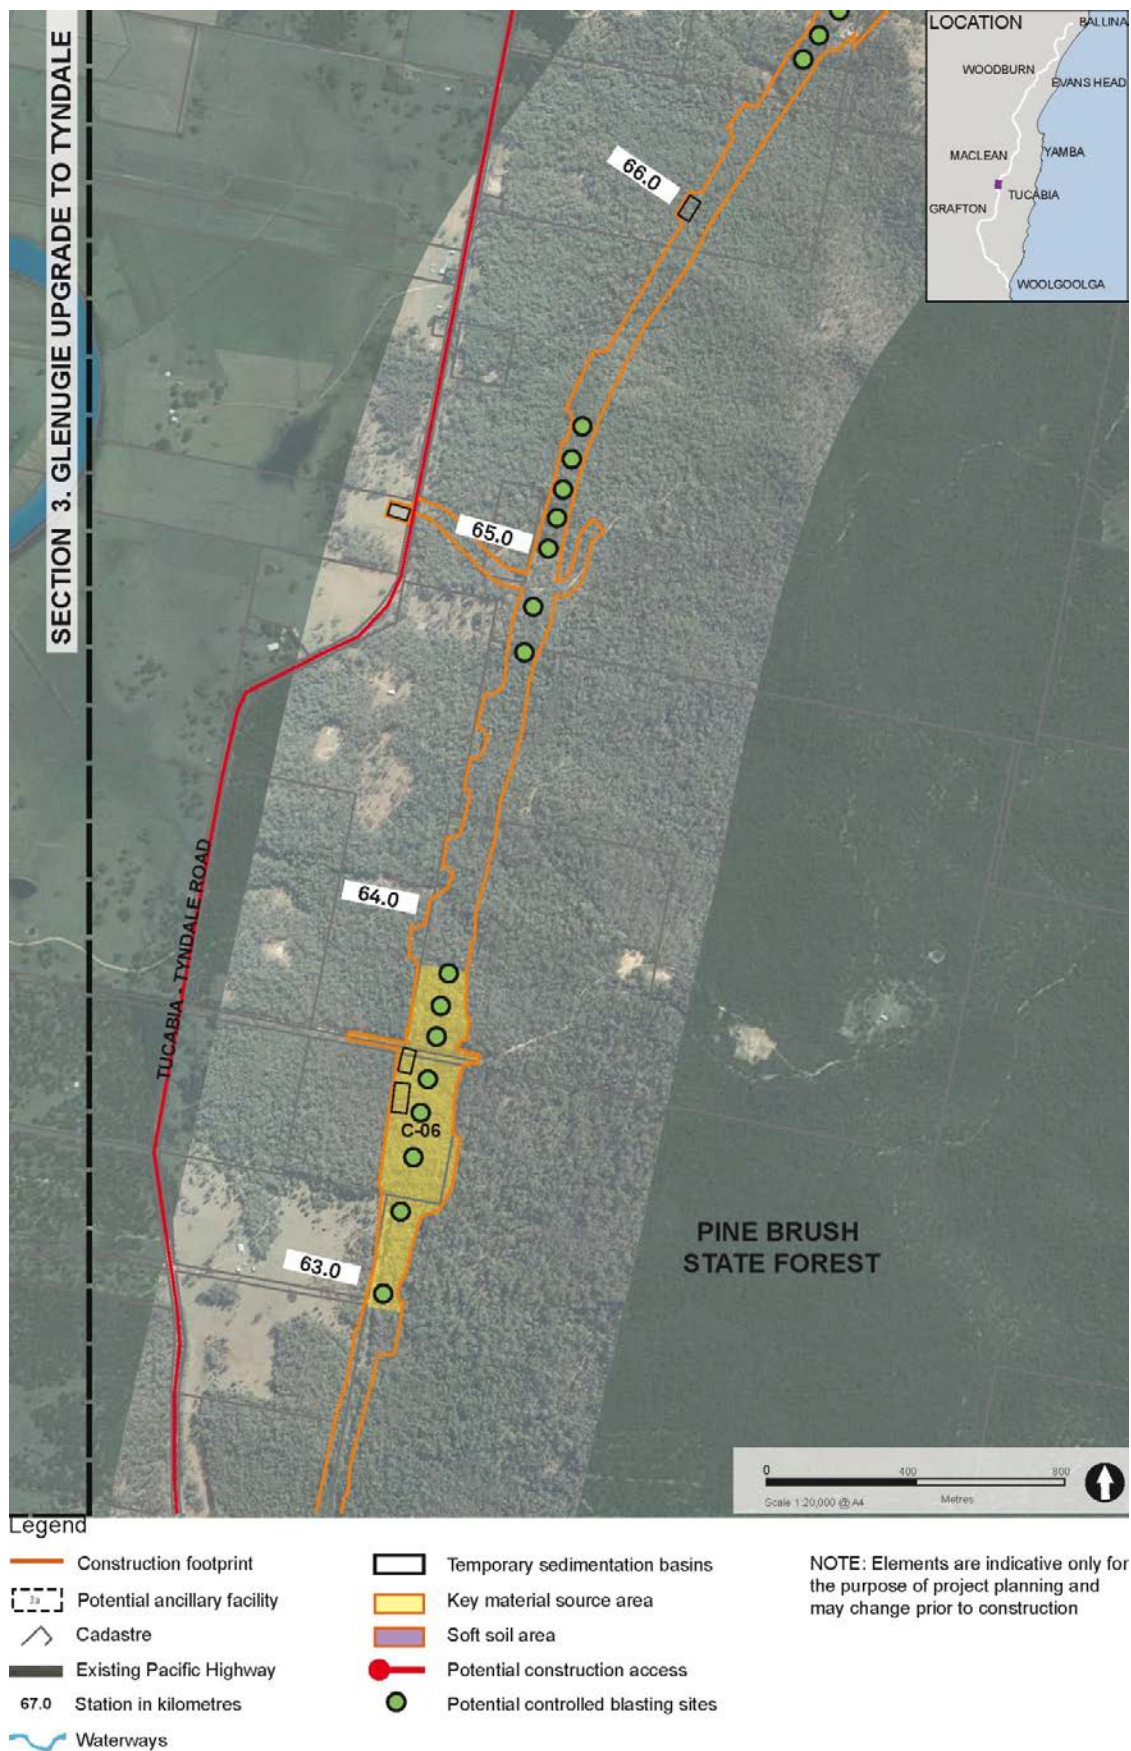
Extent of construction and construction features Section 3 (Station 62.5 to 66.5)
